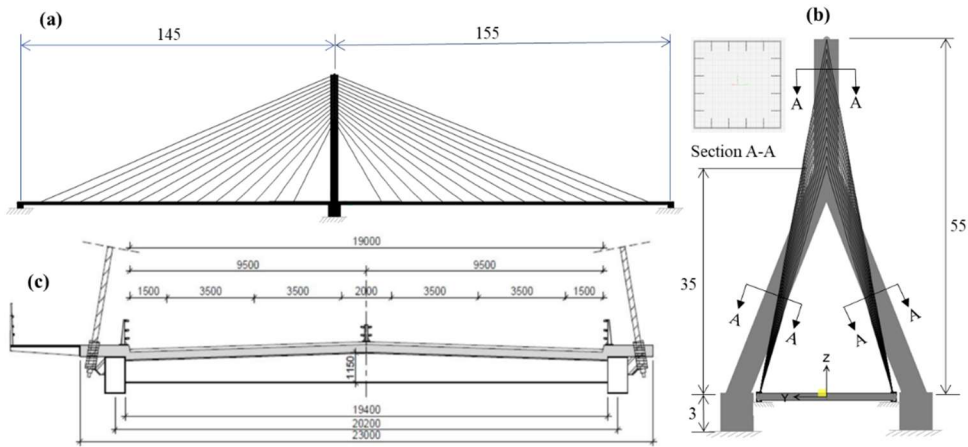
The OCSB (a) elevation. (b) Geometry of the tower. (c) Cross-section girder. (Dimensions in m)
